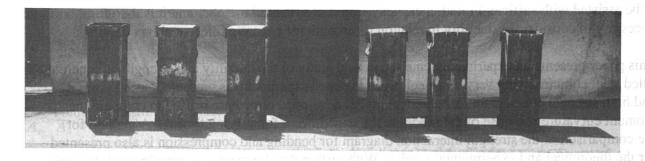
Normal Strength Concrete Test Specimens after Failure
